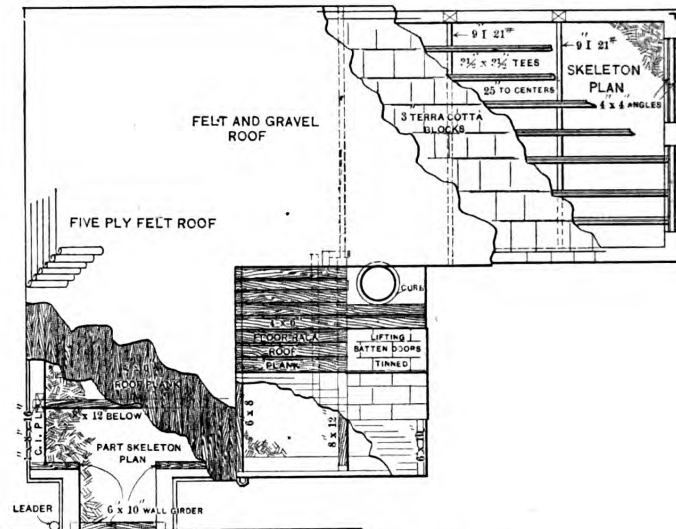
Roof Plan, Engine and Boiler Rooms.
